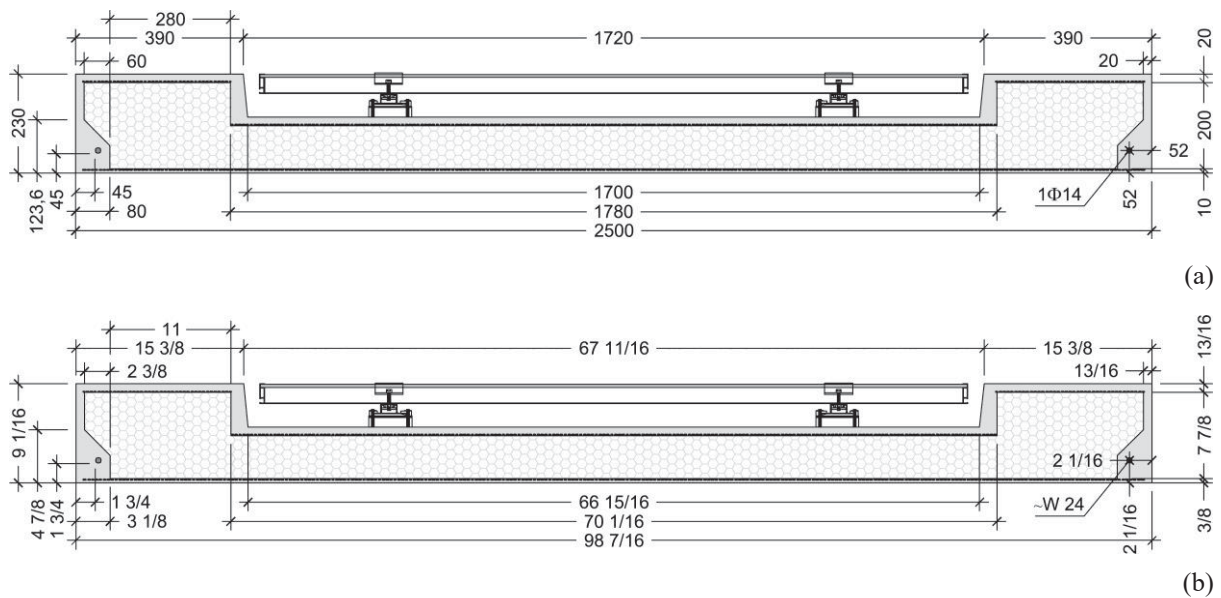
The proposed multilayered roofing panel: transverse section, with dimensions expressed in mm (a) and inches (b)
